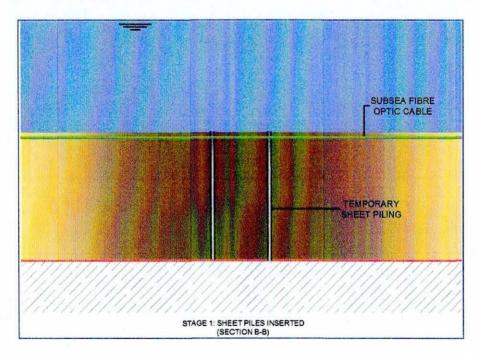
Fibre Optic Cable Crossing - Stage 1 - Install Sheet Piles
